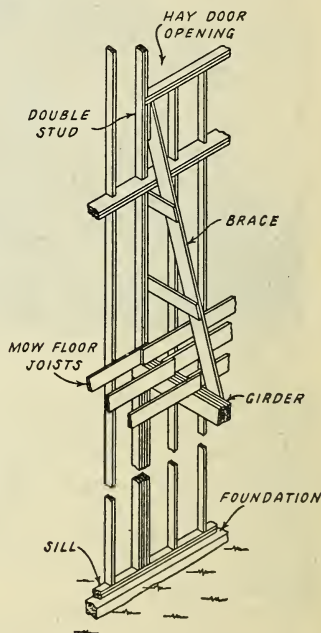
Method of bracing the end walls of haymows in barns having roofs of the self-supporting type
